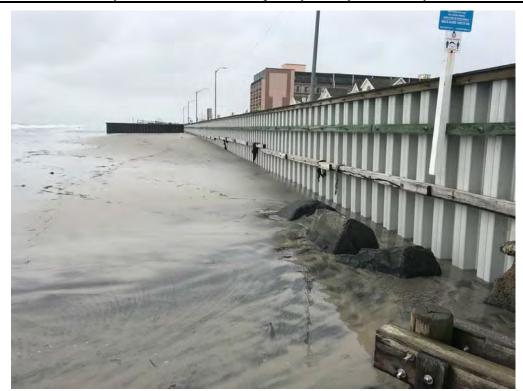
View of waterward side of vinyl bulkhead at 3rd Avenue looking southwest.
